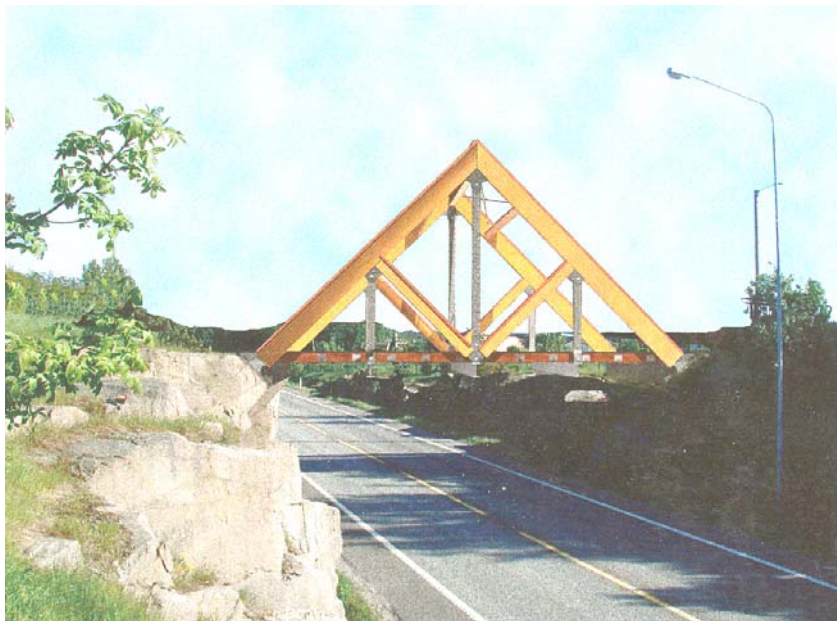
A King-Post truss bridge. [Cesaro and Piva (2003)]
